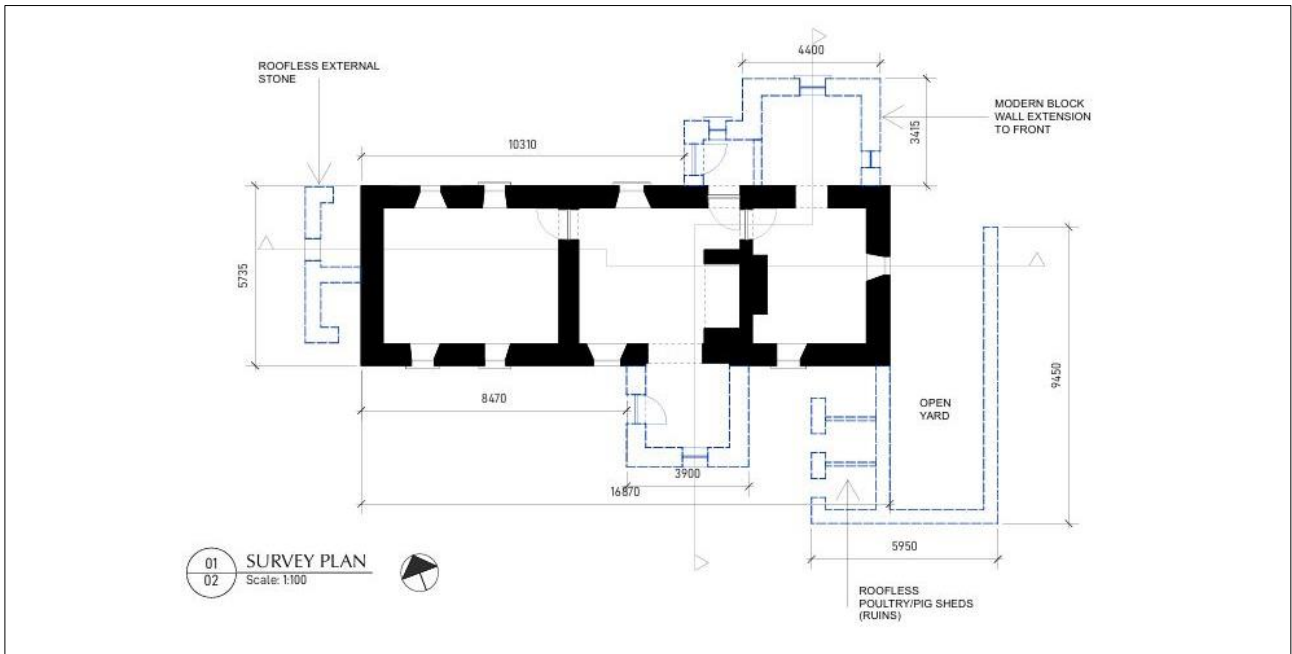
Current layout of Gamekeeper's Lodge with sections proposed to be demolished shown in blue and original footprint of Lodge shown in black.
